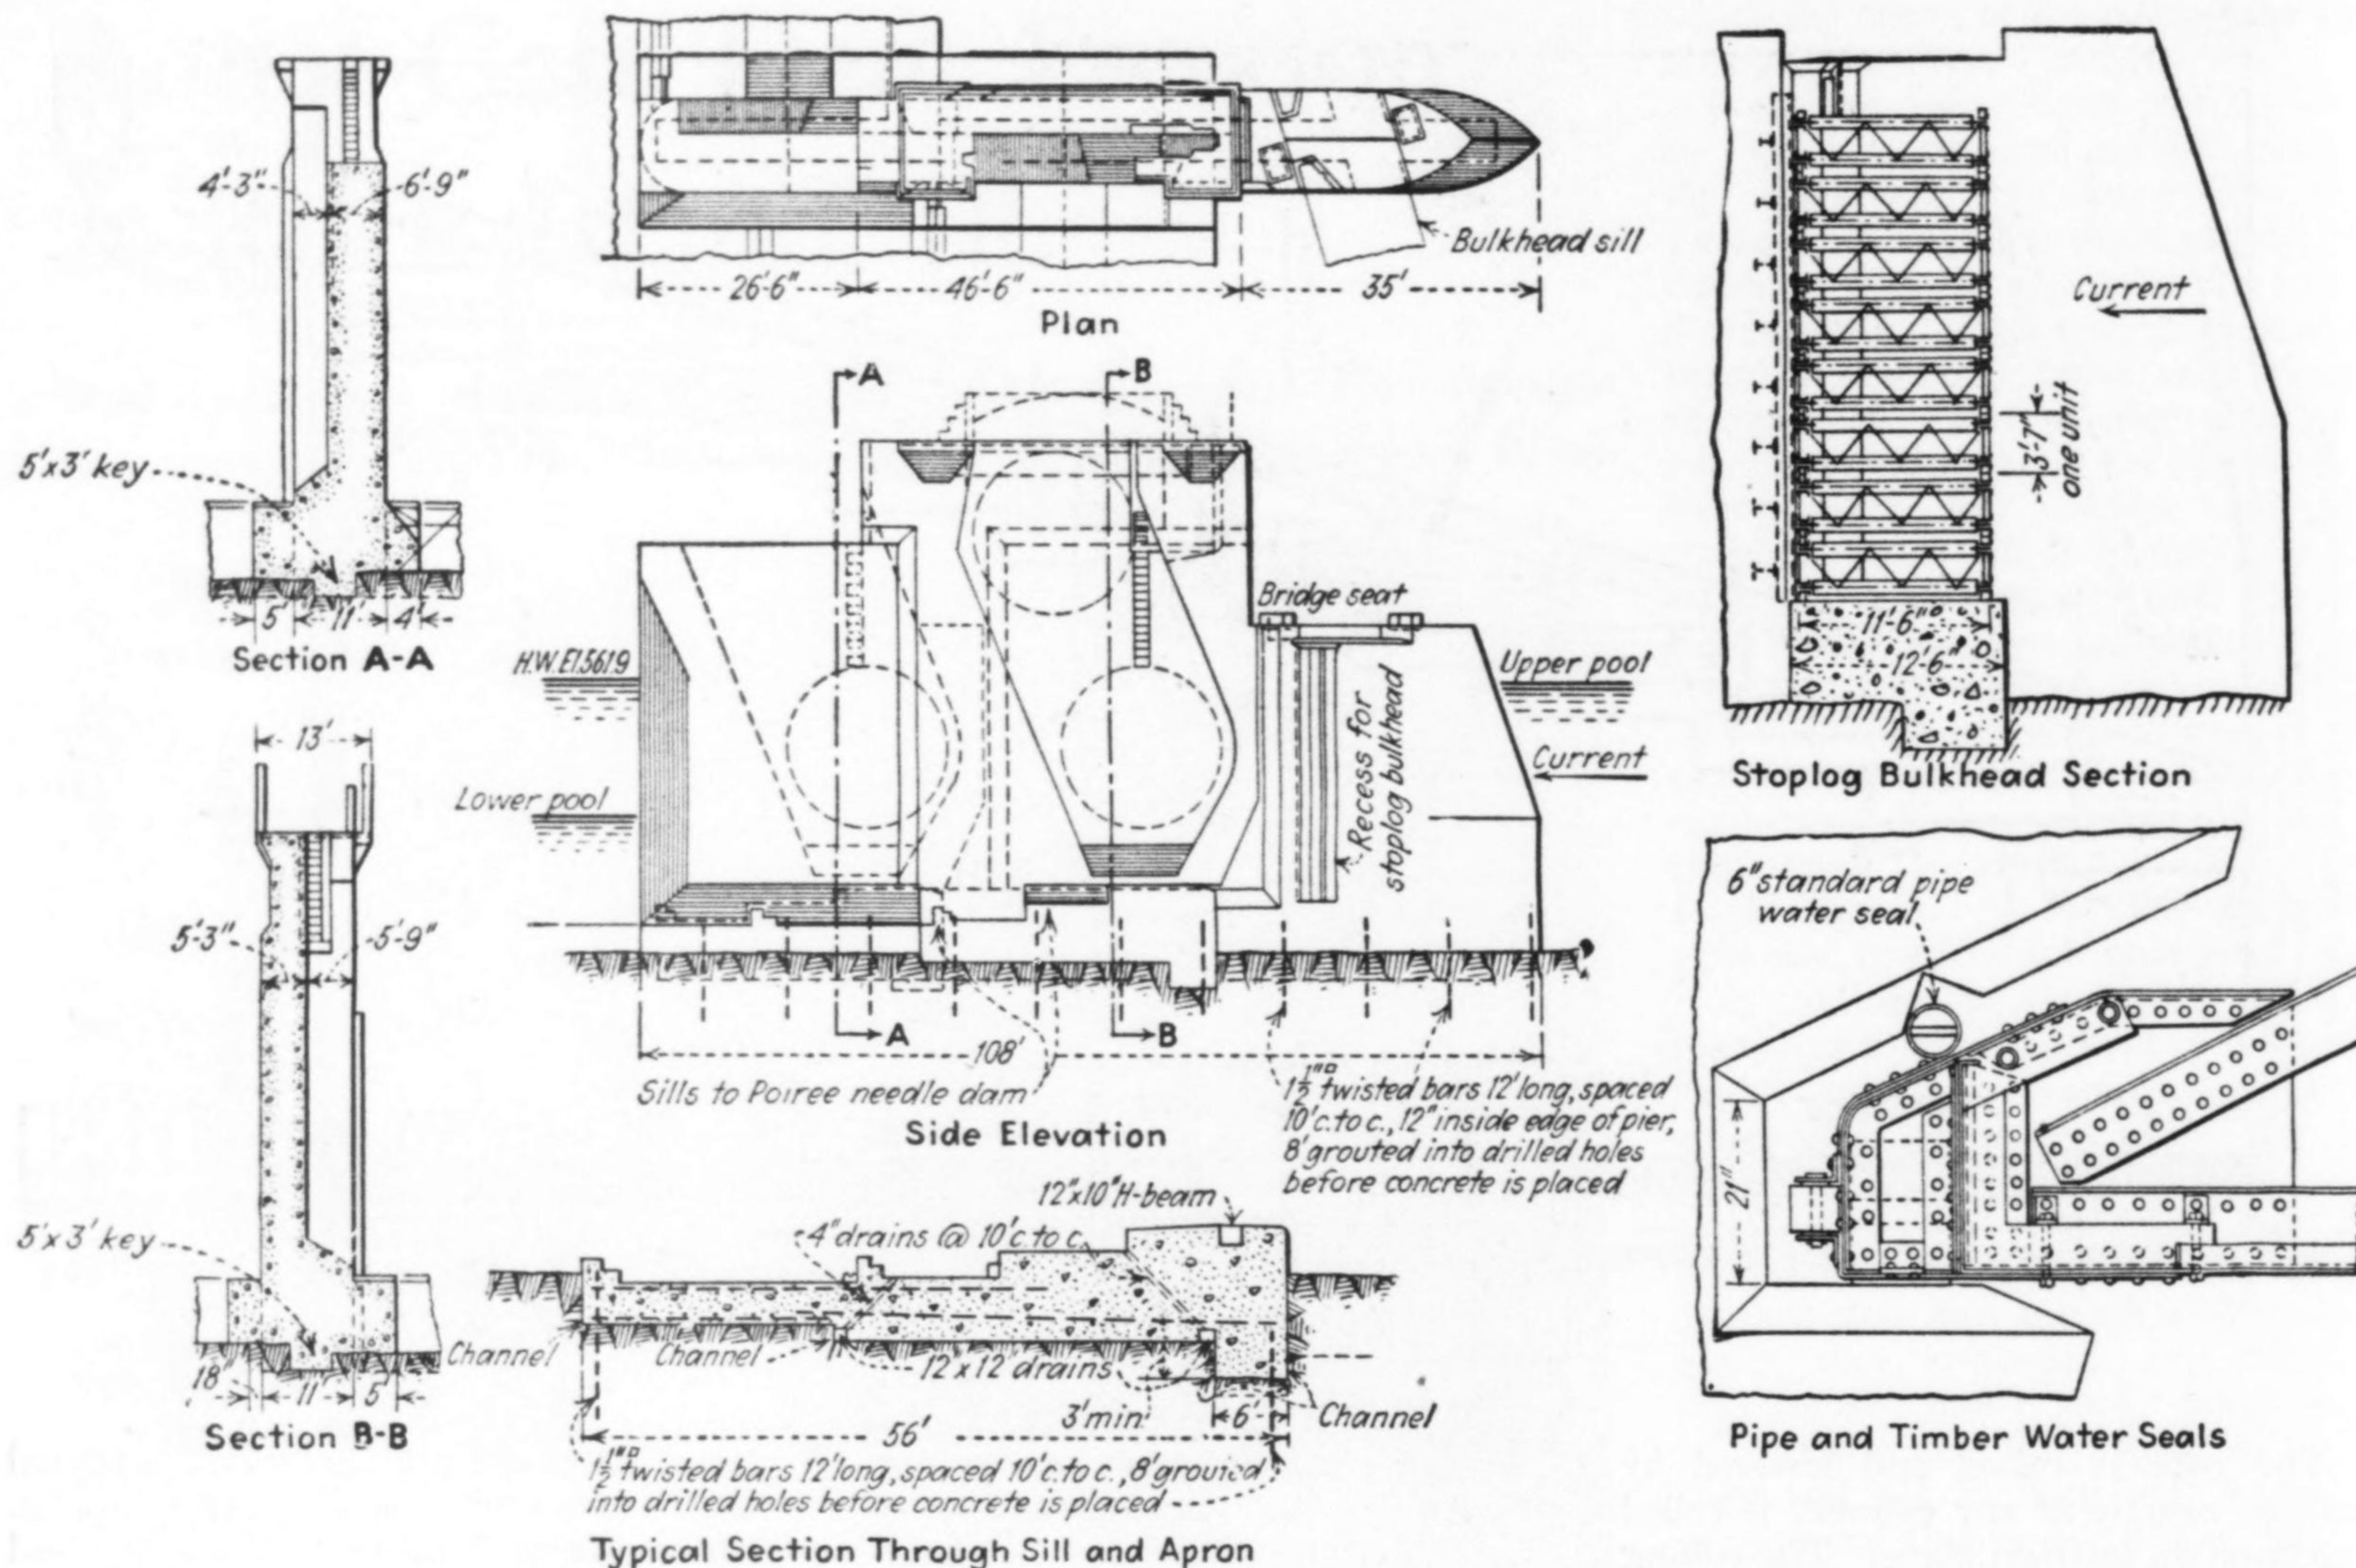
PIER AND SILL details for roller-gate dam at Rock Island, Ill.
